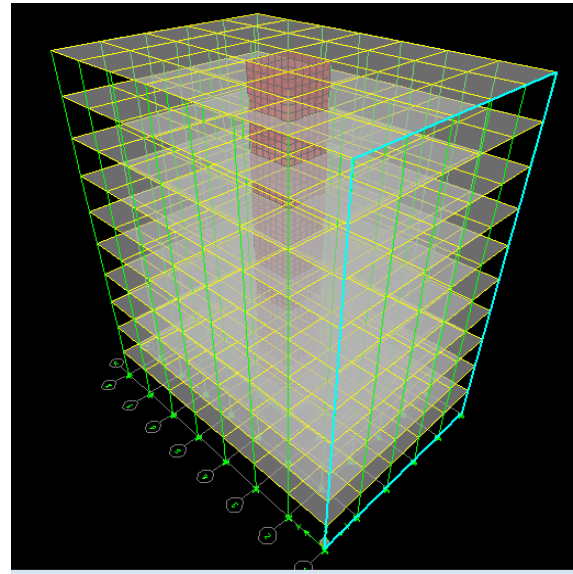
3-Dimensional View of 10 storied structure with Core shear wall
